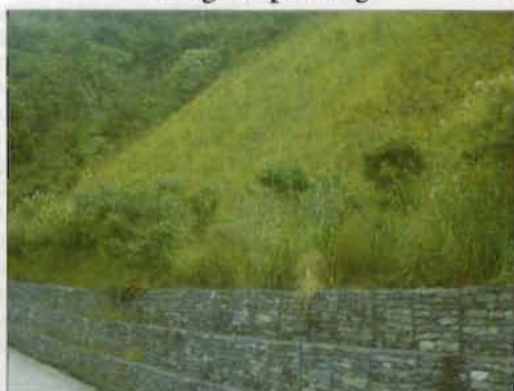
A typical cut slope in deep colluvium on the Dharan-Dhankuta road (eastern Nepal), stabilised using a combination of a gabion toe wall and bio-engineering
